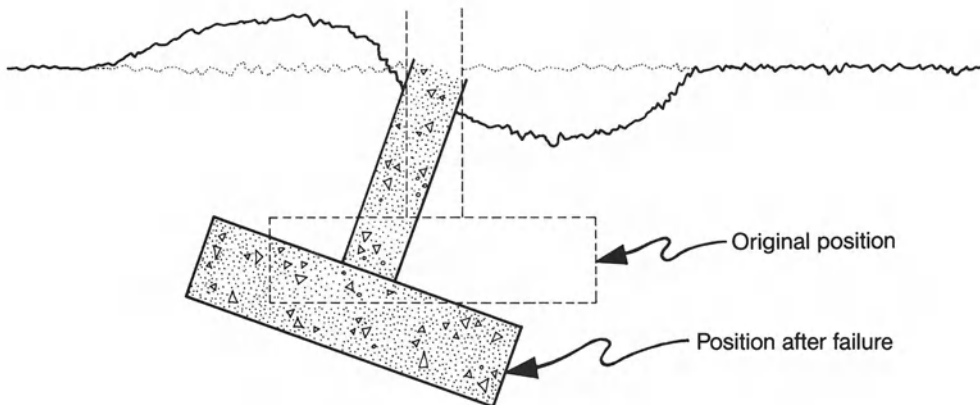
Footing failure due to breaking into the soil.
